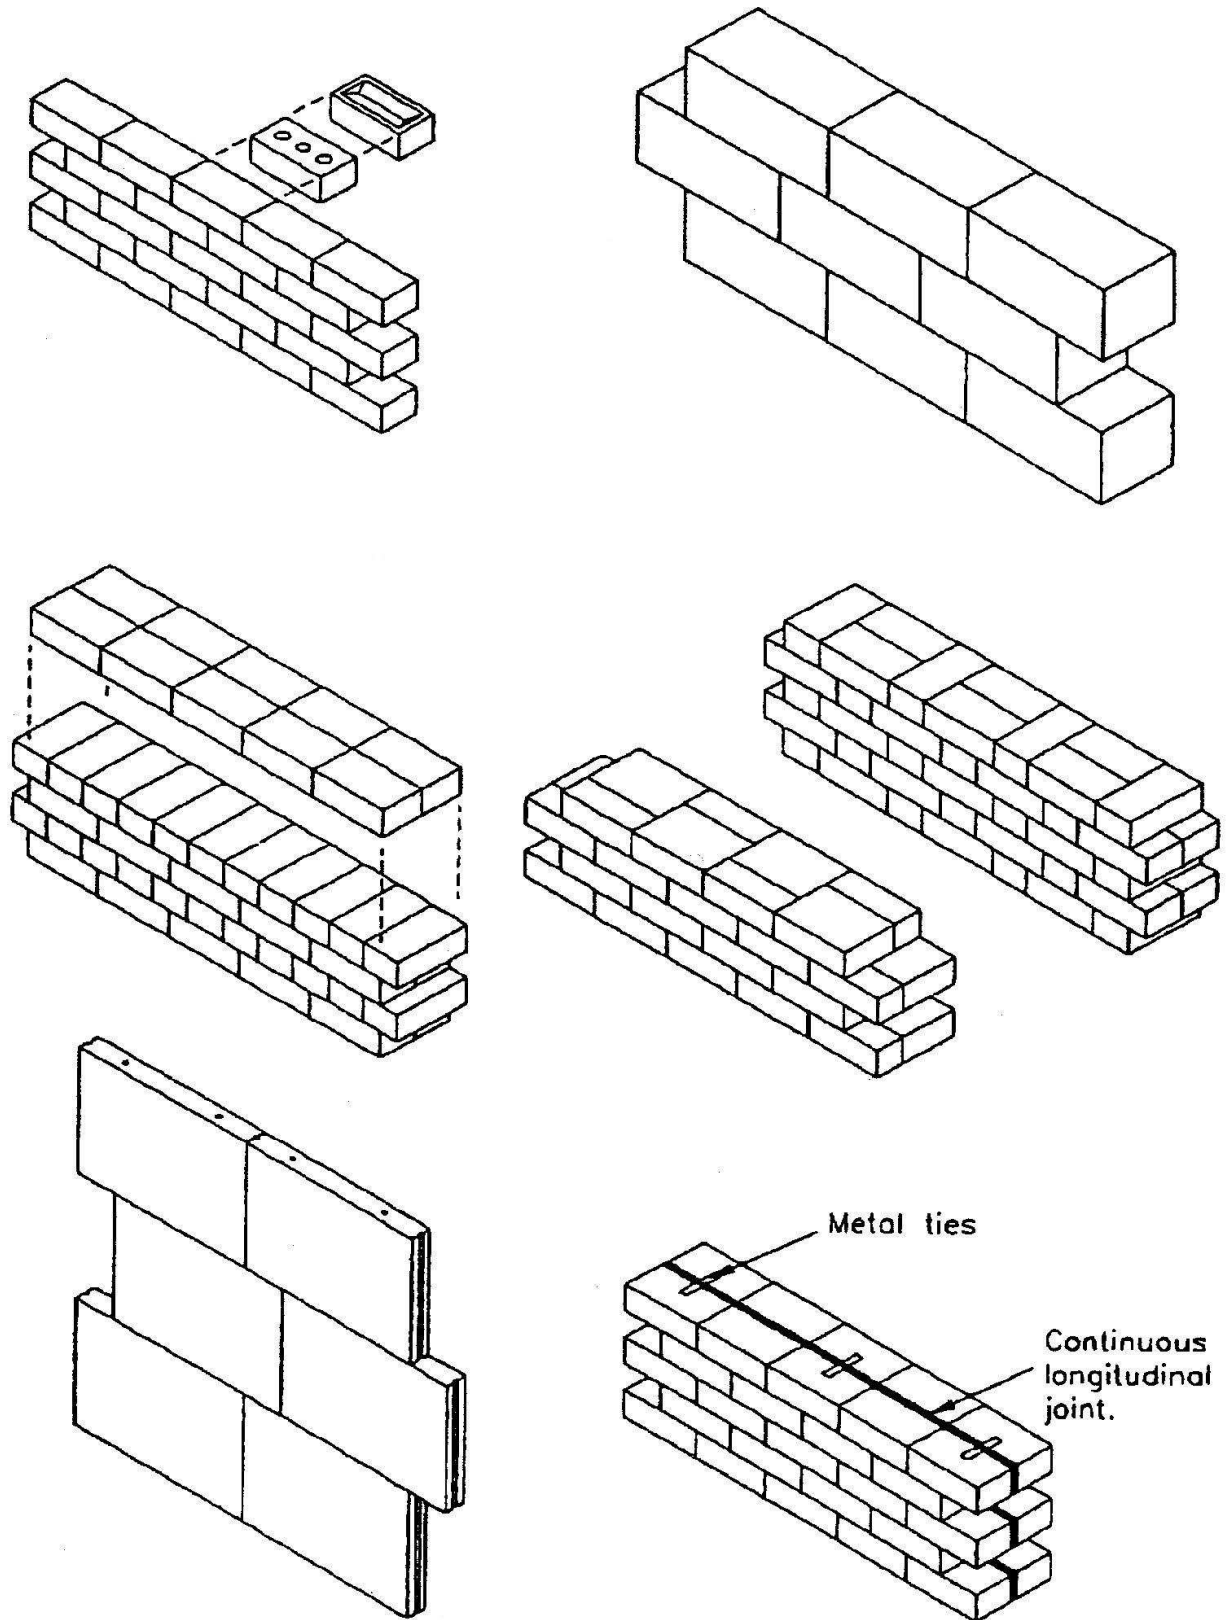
Examples of bonding arrangements using Group 1 masonry units.
